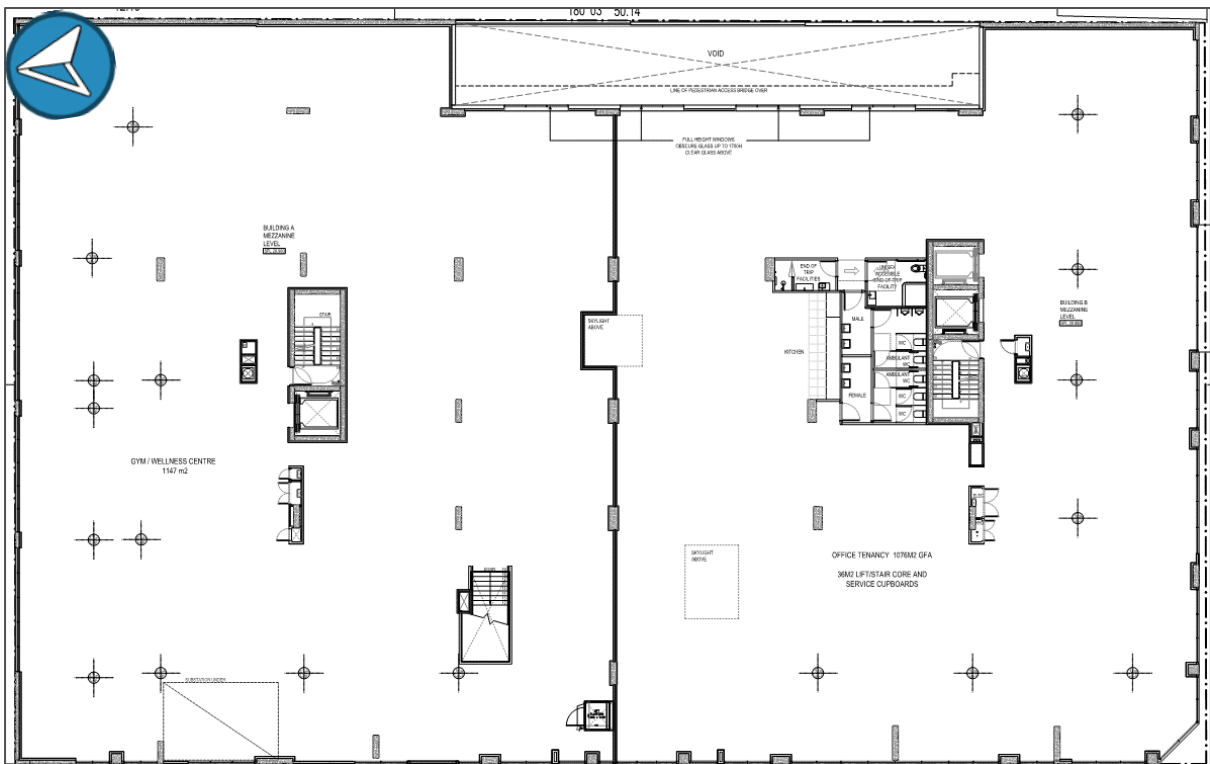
Proposed Floor Plans – Mezzanine Level (Image Source: Artisan Architects)
